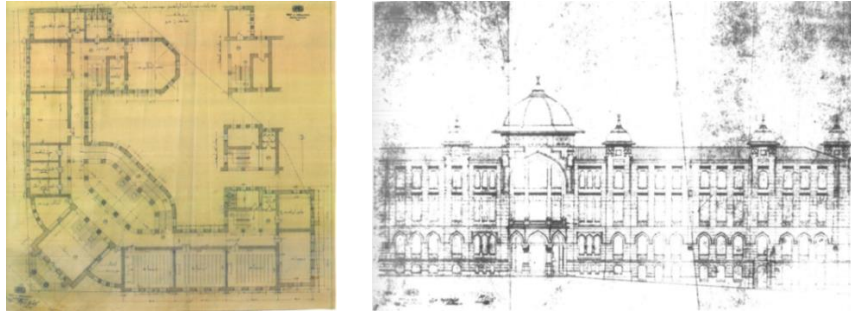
a) *Gedikpaşa Engineer School Ground Floor Plan* [51], b) *Gedikpaşa Engineer School Facade* [42]
